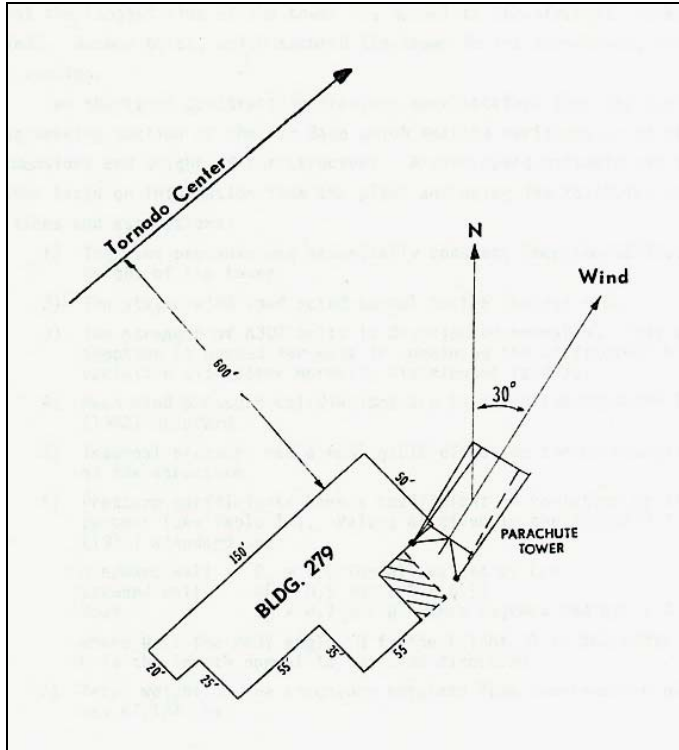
Plan view diagram of the parachute drying tower at Building 279. The tower toppled to the northeast as the tornado passed by to the northwest.
